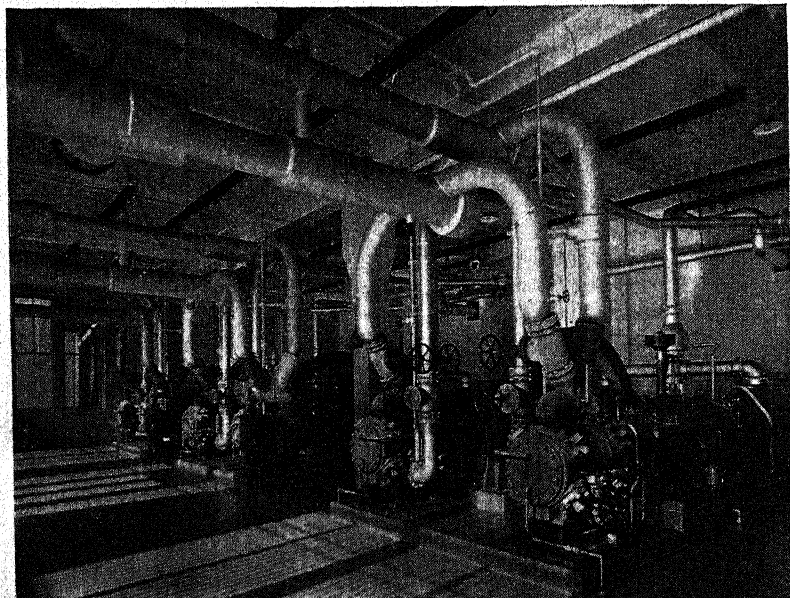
Arc welded piping connections contribute to the neat appearance of the engine room.
